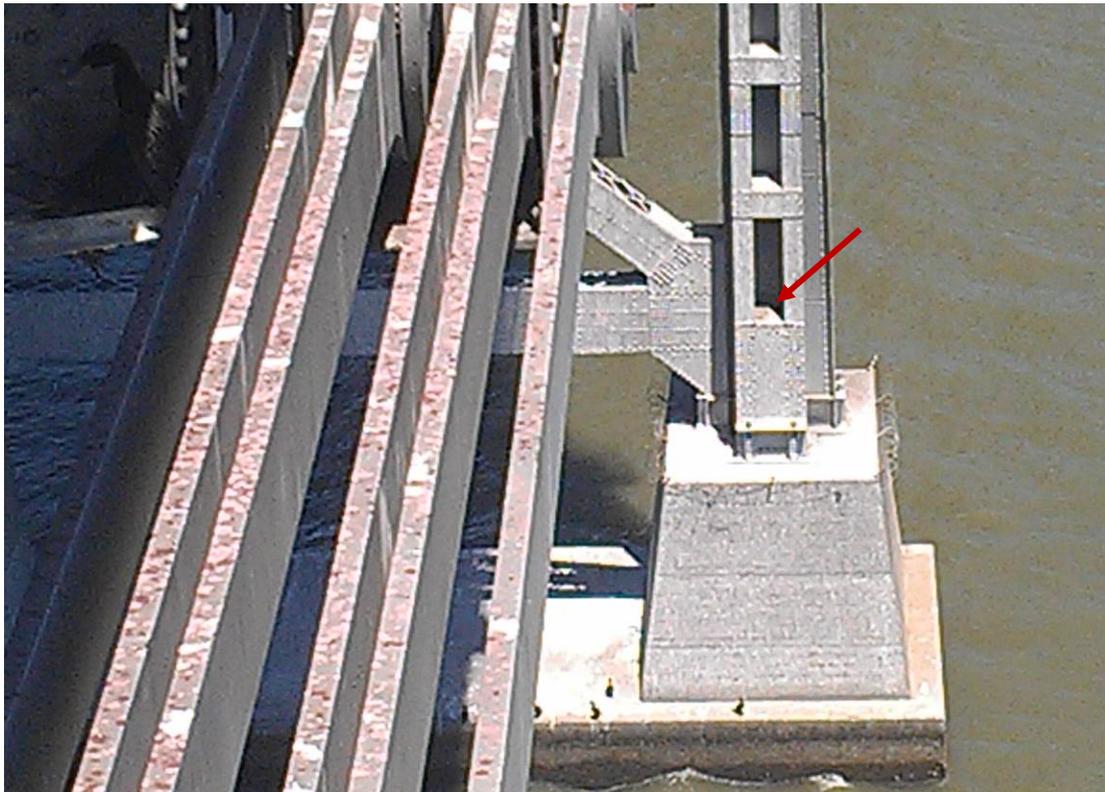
Peregrine falcon 2014 nest site located in a west-facing alcove at the base of the south tower of Pier E8.
